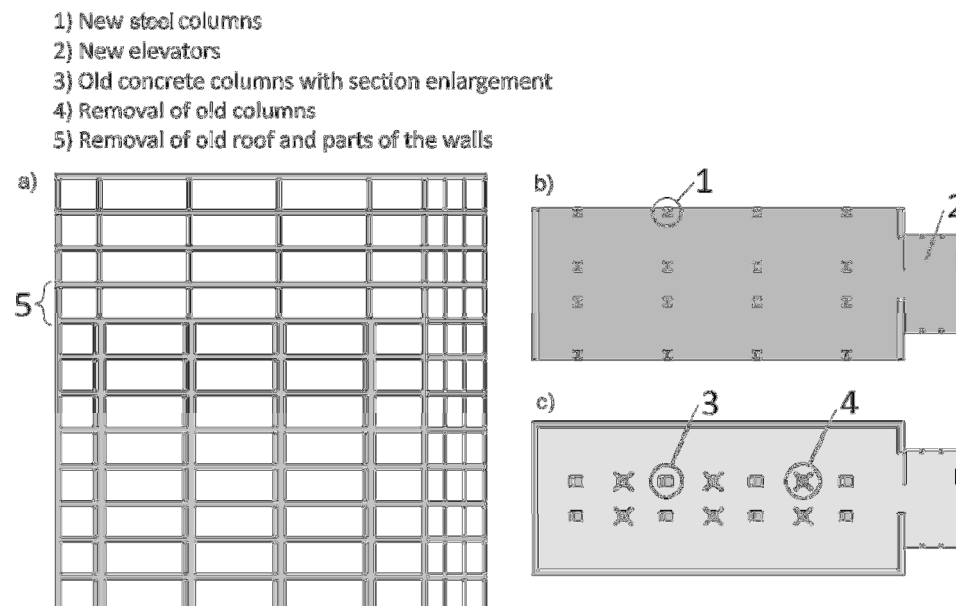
, Simplified illustration of HK60; a) section, b) plan of new part and c) plan of old part.
